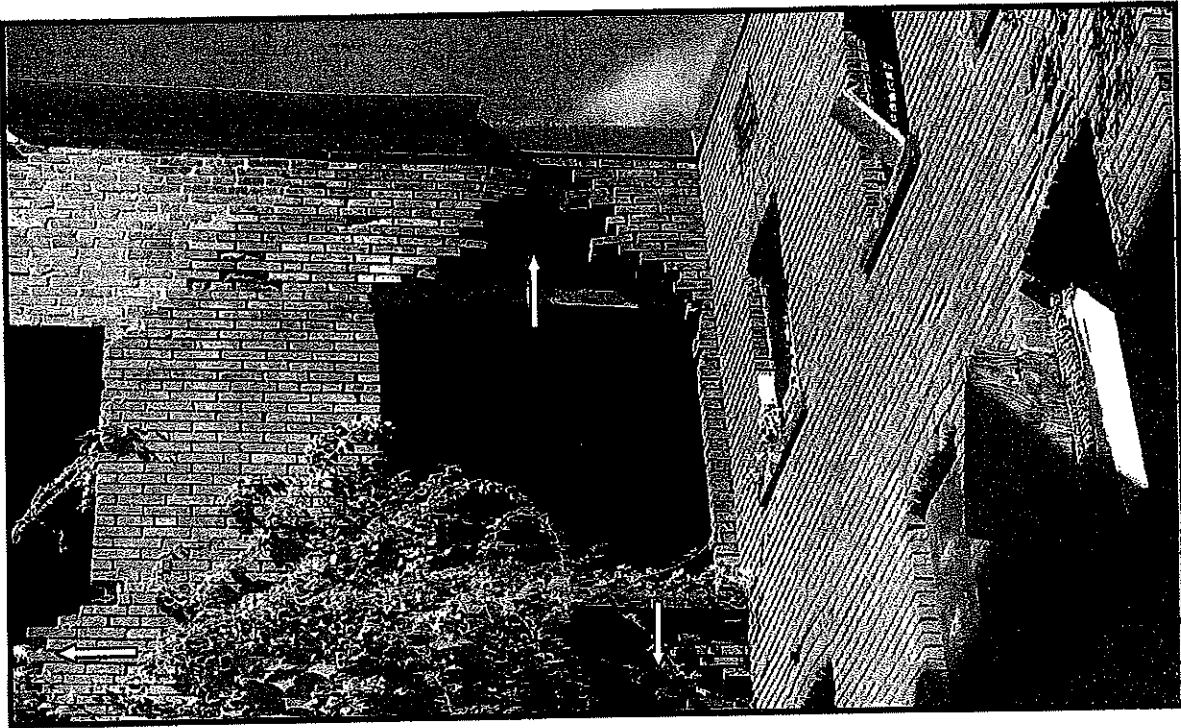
224 Washington Street East Wall Masonry Failure at Window Head and Sill.
